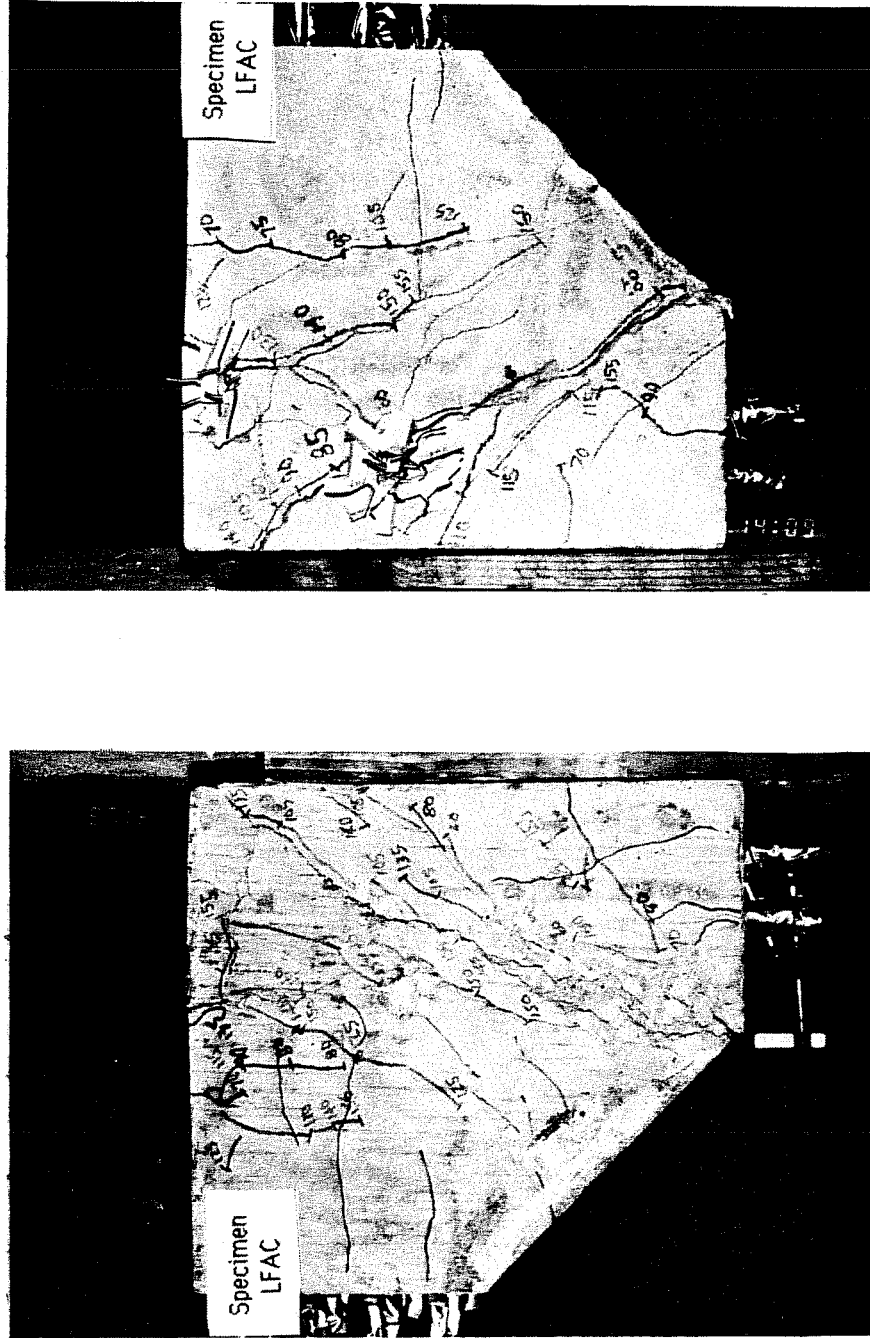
Specimen LFAC-Development Failure of Longitudinal Reinforcement (North and South Faces)
